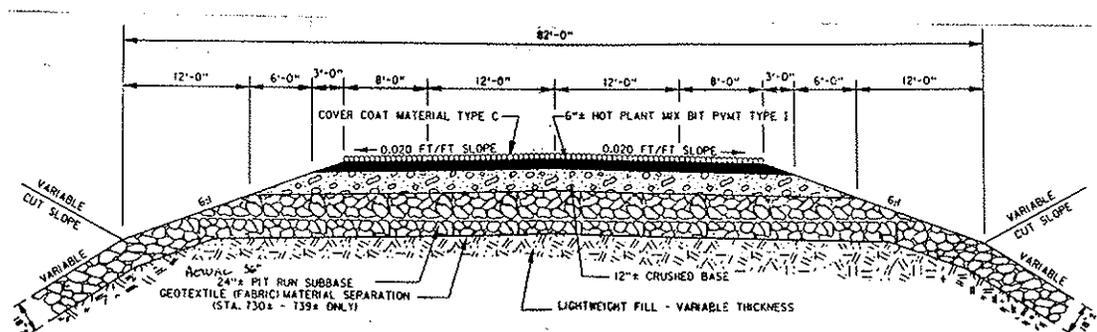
Typical section through pavement and base and subbase courses at the Double Nickel Slide.
